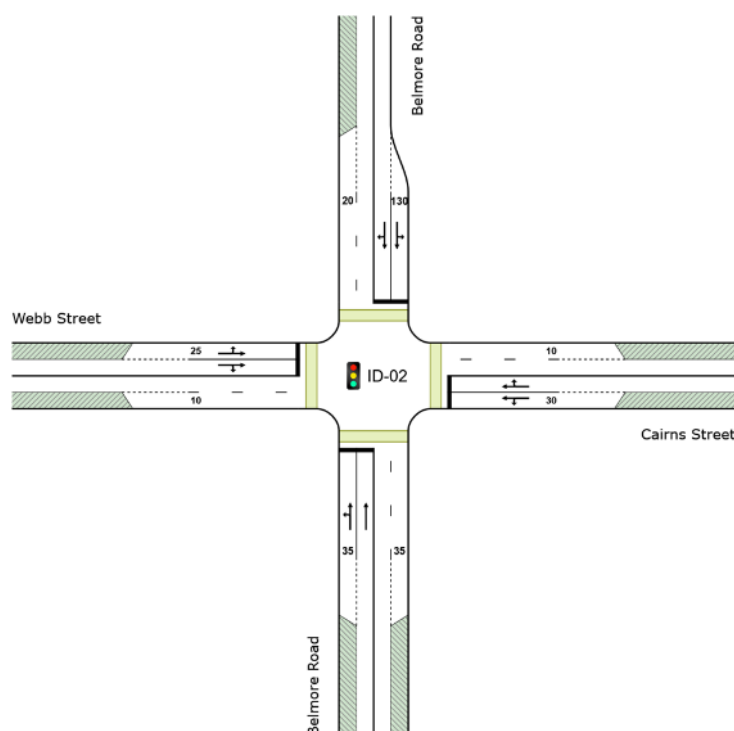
Belmore Road/Webb Street/Cairns Street intersection layout
